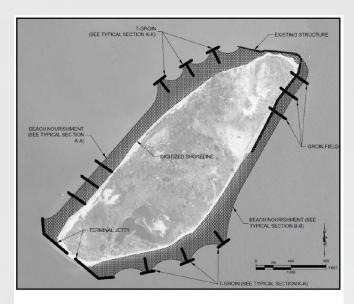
Plan view of beach nourishment with structures plan view layout (Alternative 5)
